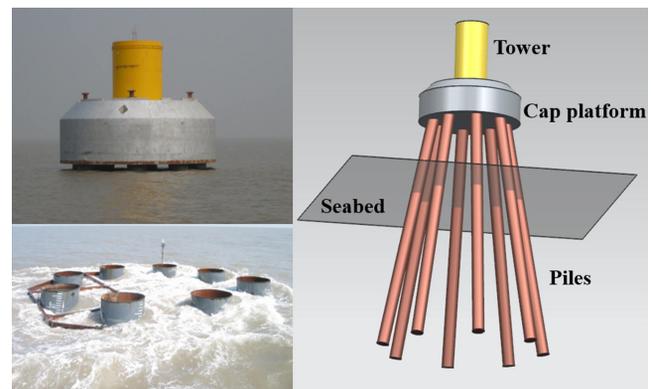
Photos of a high-rise pile cap structure under construction in the Donghai Bridge Wind Farm (left) and the foundation sketch model (right)
